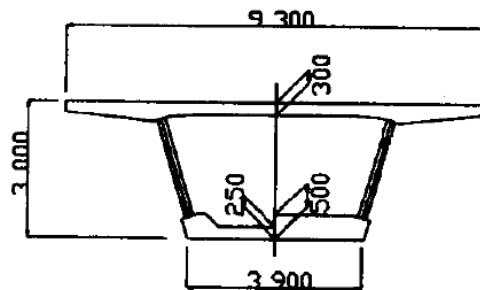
Cross-section of the Matsunoki bridge, dimensions in mm [6] p.15
